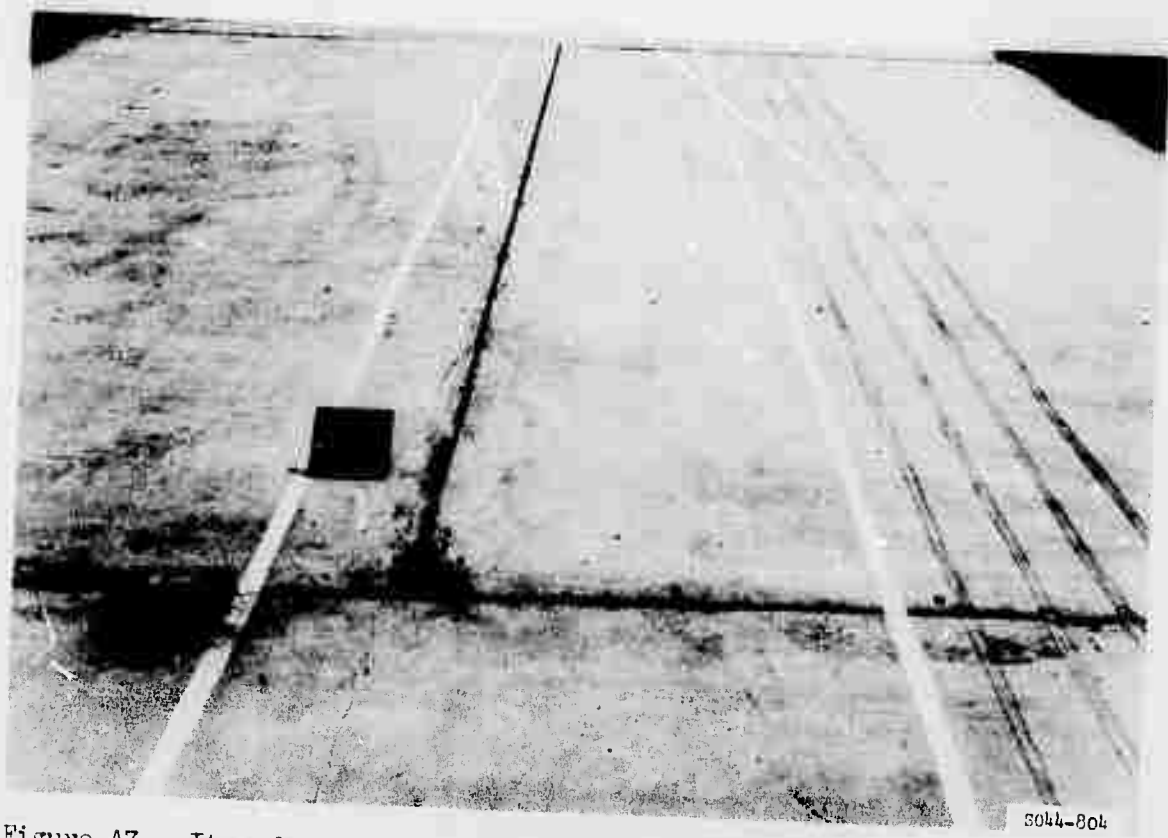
Item 2, lane 1, rigid pavement test section, prior to traffic
